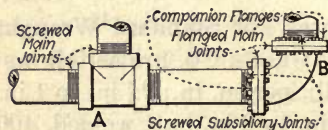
Screwed And Flanged Joints In Steam-Piping.
